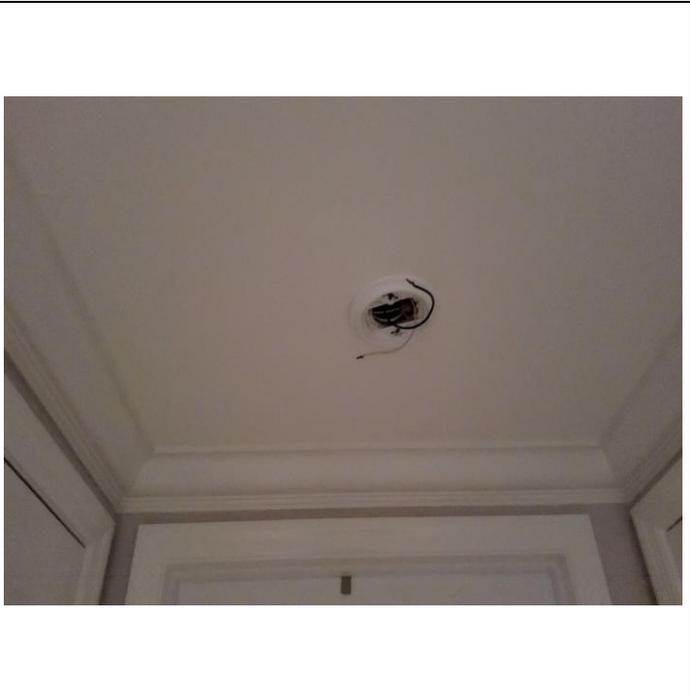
Item 28.6. Missing smoke alarm outside the sleeping rooms.
